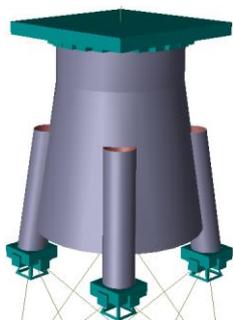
Shell transition piece connected to the jacket and tower beam structures.
